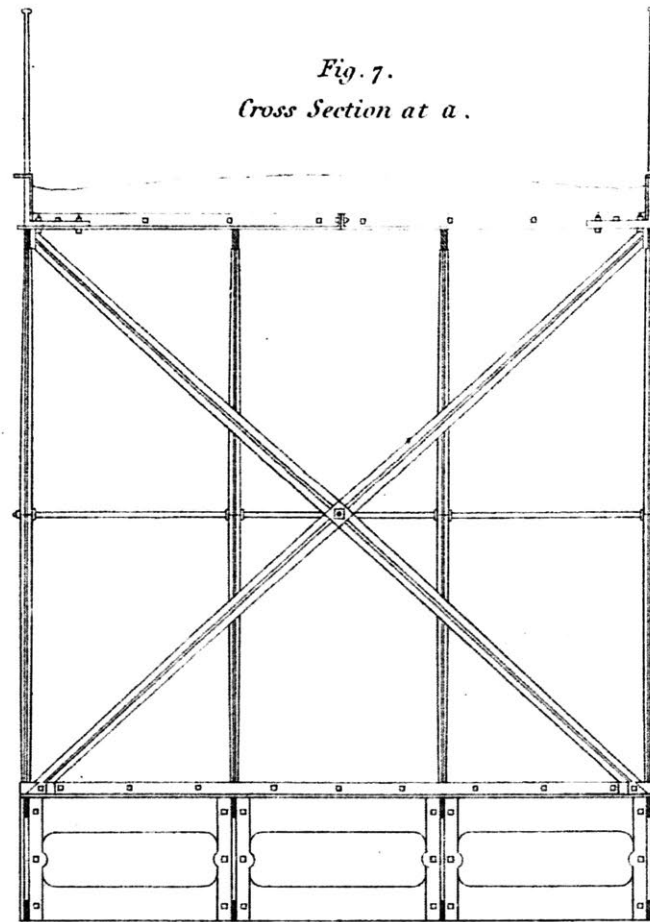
Close-up, section, Bonar Bridge (Sixth Report of the Commissioners for Highland Roads and Bridges 1813)
